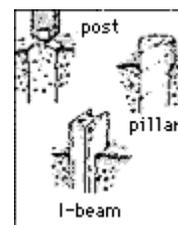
You can minimize damage to trees near foundations by using posts, pillars, or I-beams
